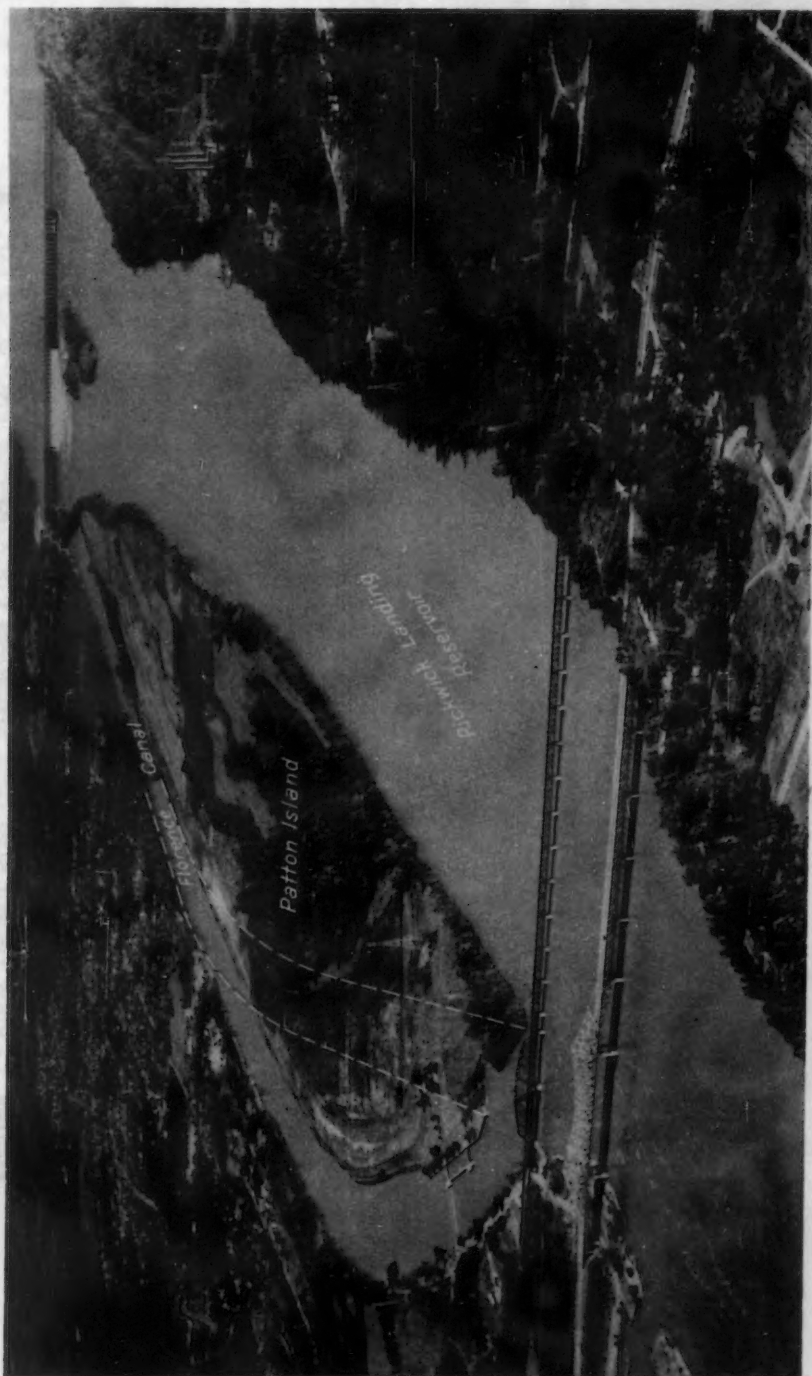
GENERAL VIEW - FLORENCE CANAL AND WILSON DAM
